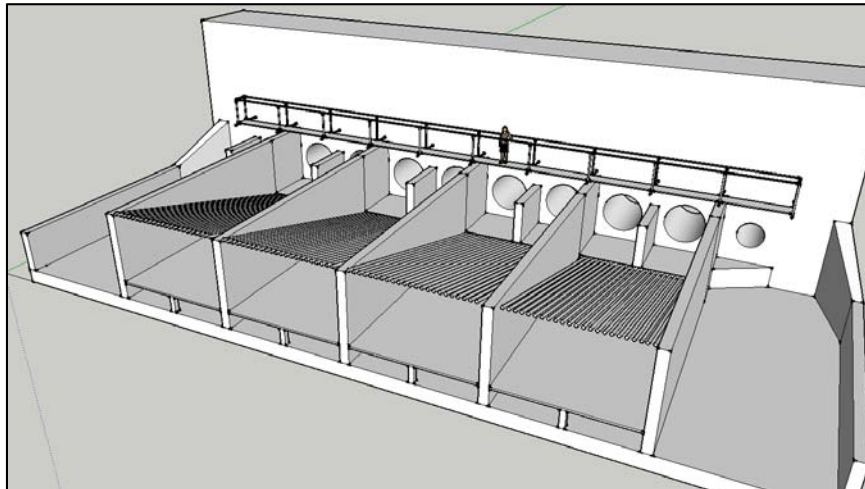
3-dimensional view of features on the downstream side of KLOG with five raised side walls, a raised floor, the concrete bullnose remaining, and a picket weir at the base of the existing gate walls. An animation of this graphic can be viewed at: <https://www.youtube.com/watch?v=5Kp4tNFWUQI>
